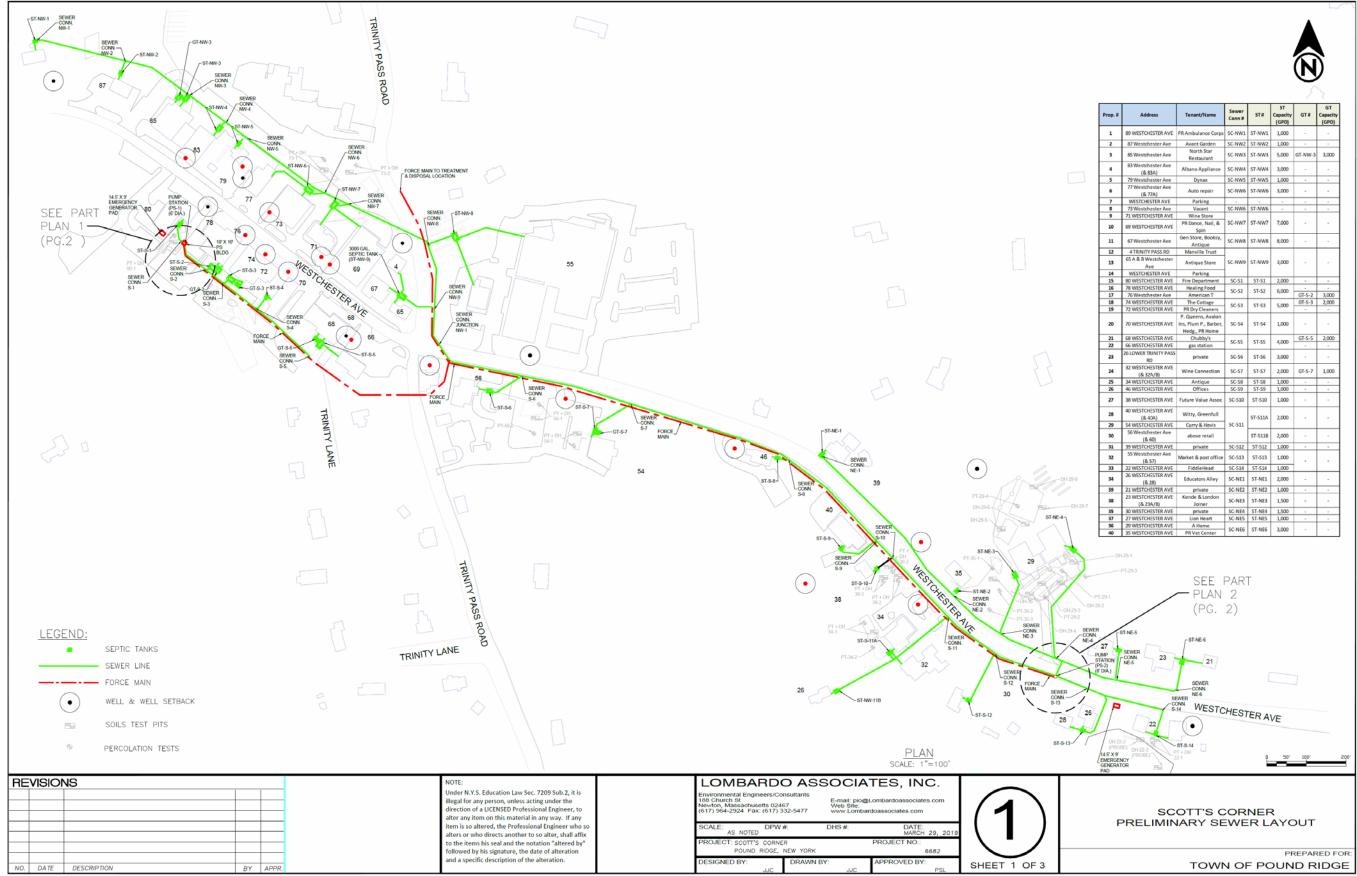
Scotts Corner Preliminary Sewer Layout Plan
